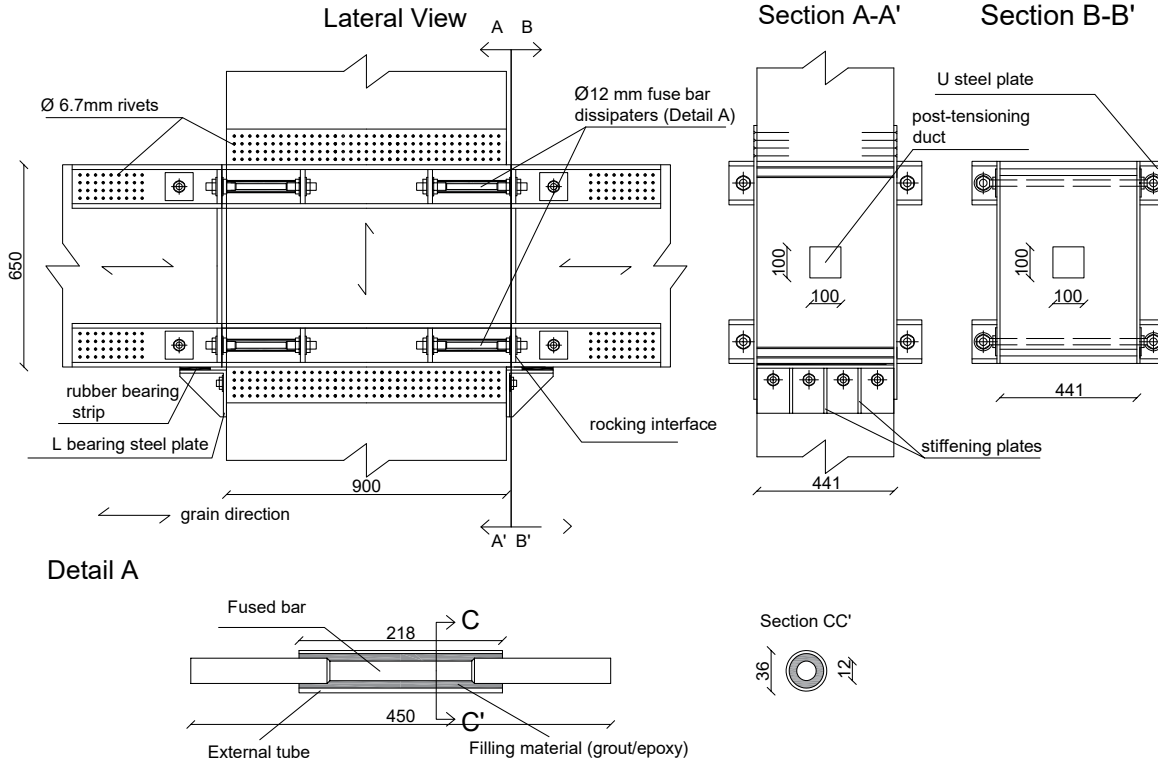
Structural detailing: beam-column hybrid joint and fuse dissipater.
